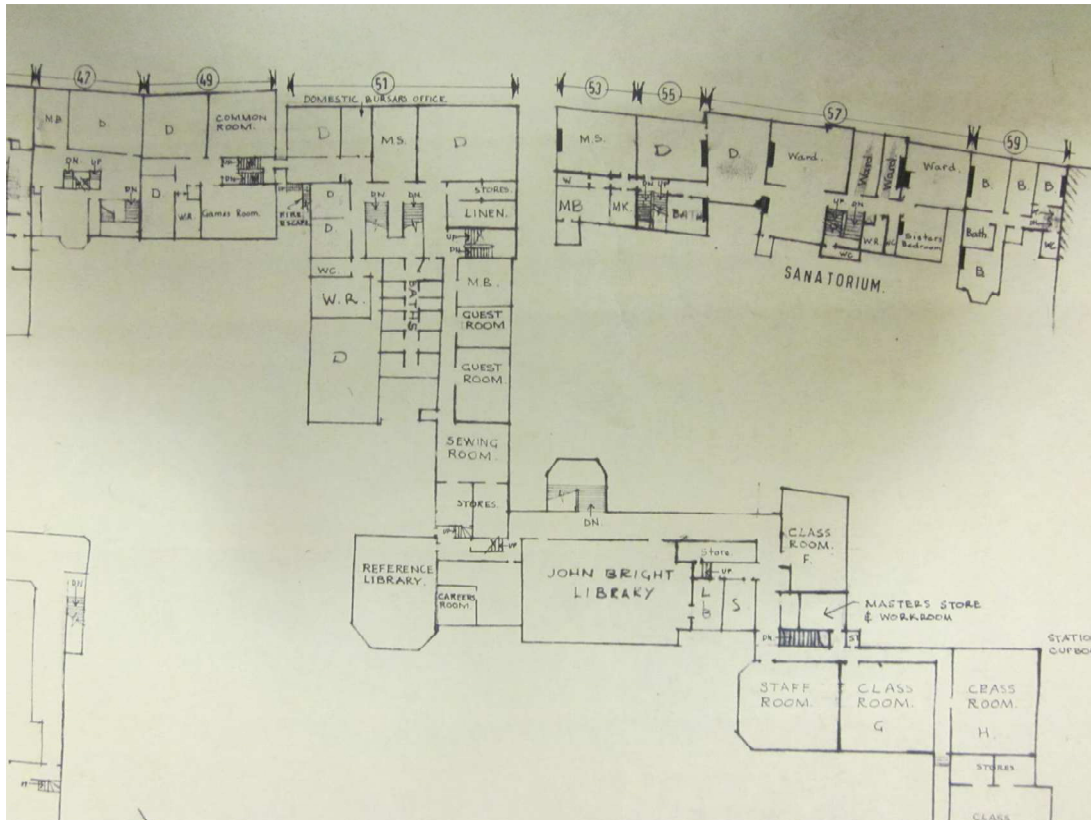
1977 Colin Rowntree survey: first floor showing two rooms in former gymnasium
